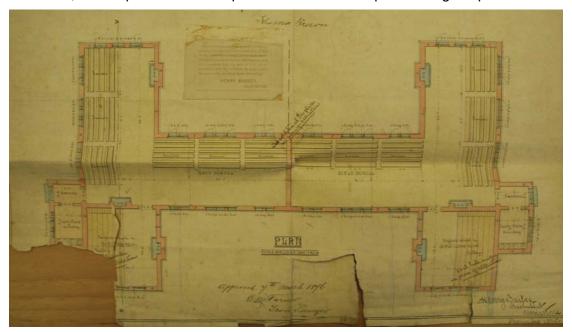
Original ground floor plan of the building by Henry Barber dated November 1875 (CRO(B) Z1041 1875-1904)
